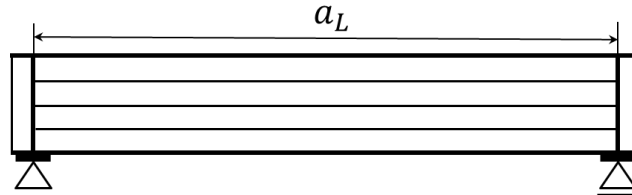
Aluminum Alloy Girder with Longitudinally Stiffened Web
